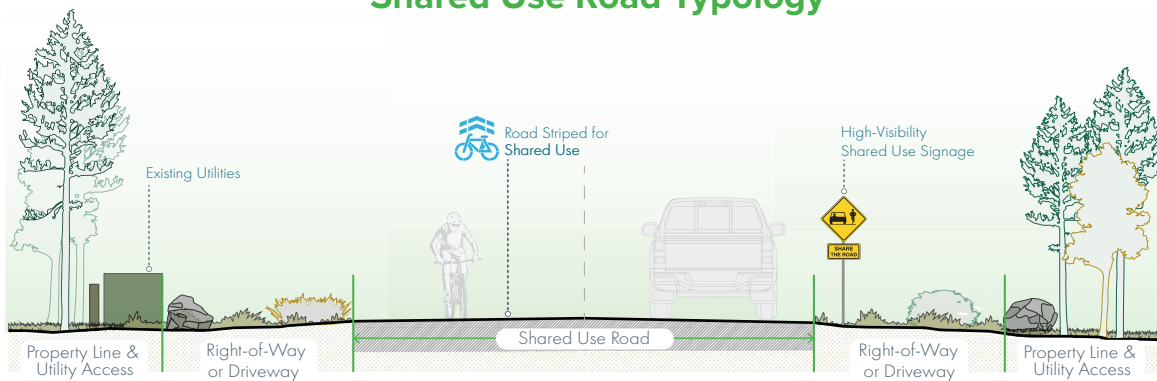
The above graphic showcases the desired condition for Shared Use Roads. These should be incorporated along existing roadways that are constrained to a narrow corridor and cannot be widened due to adjacent utilities, drainage, or narrow right-of-way.
